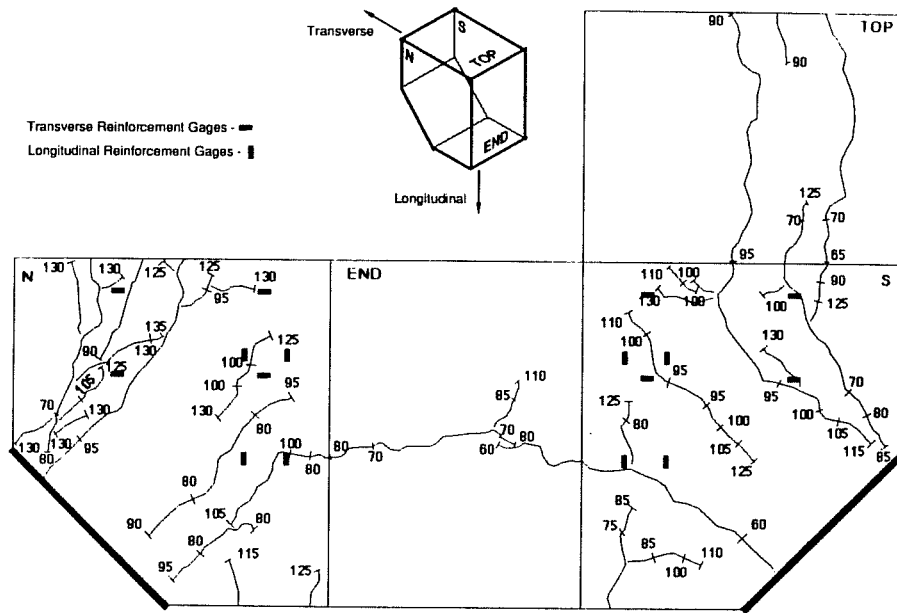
Crack Patterns for Specimen HFSR-B
